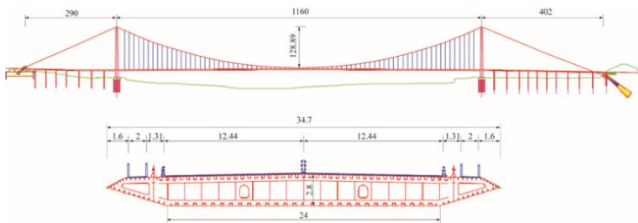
Arrangement of the bridge span and the bridge deck cross section (unit: m)
